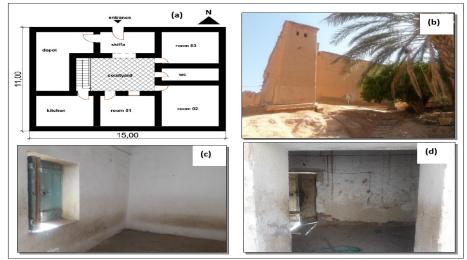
(a) plan of the house sample case; (b) the opaque façade; (c) room view; (d) skiffa. (Source: Author)
